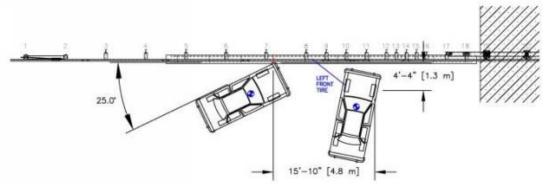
Test Impact Drawings for Test No. MWTC-1.
